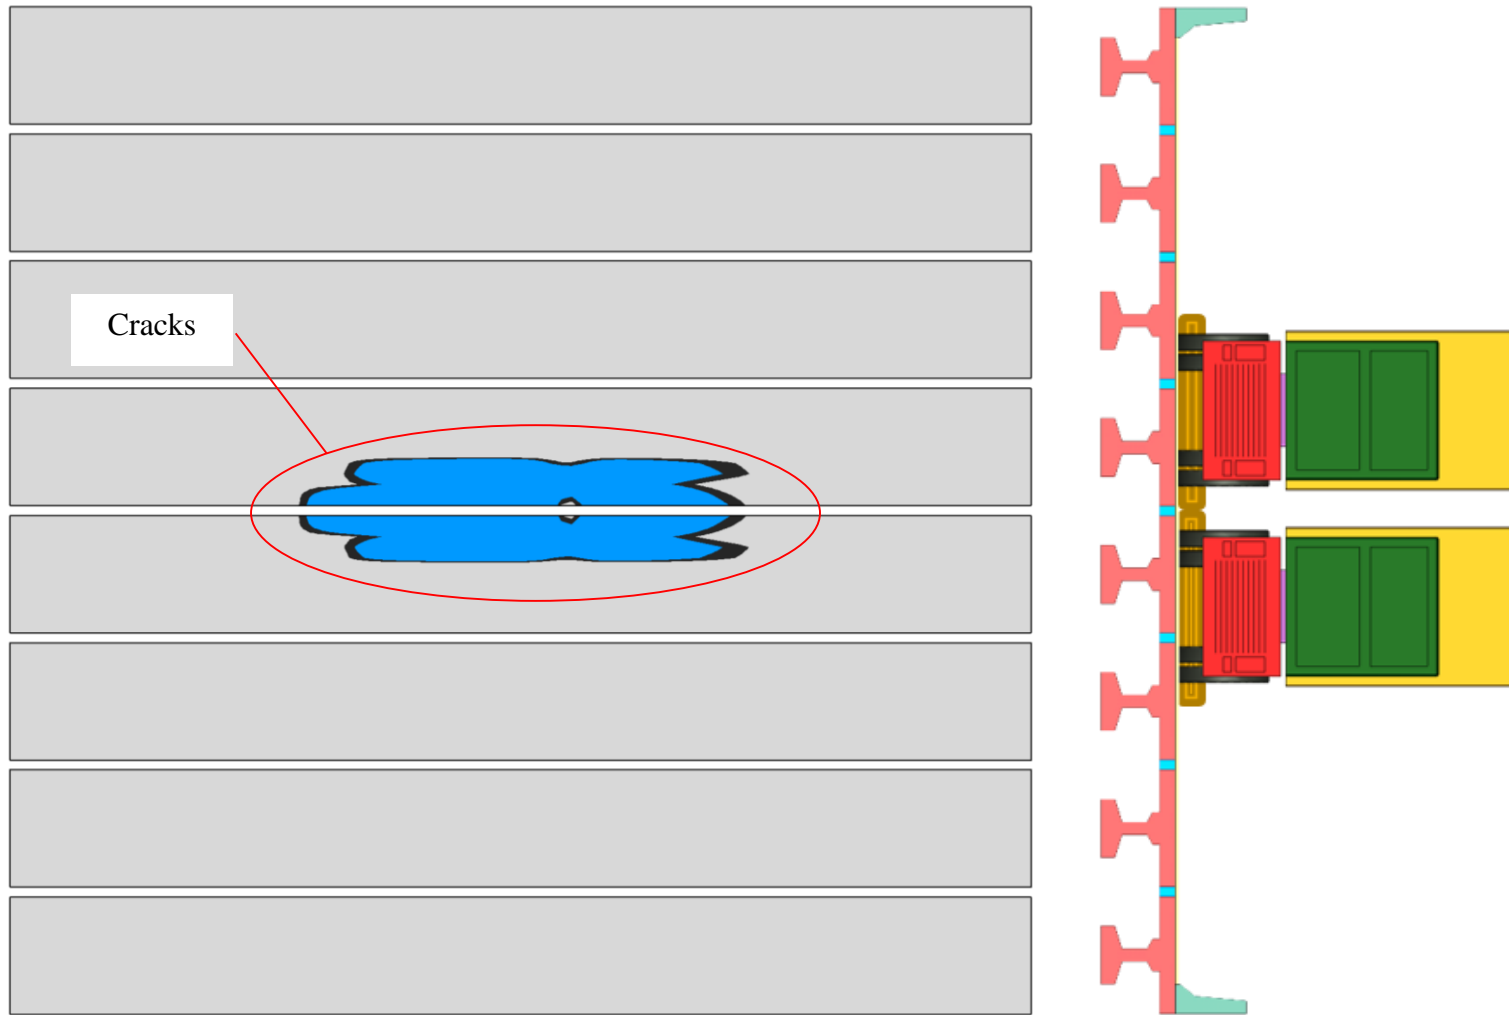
Typical crack pattern under traffic loads at Location III (Bridge span of 50 ft, width of 52.5 ft, no diaphragms)
